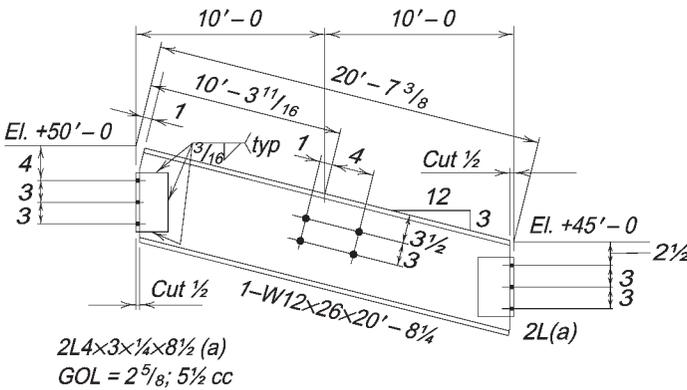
Sloped bolted/welded double-angle connection.
